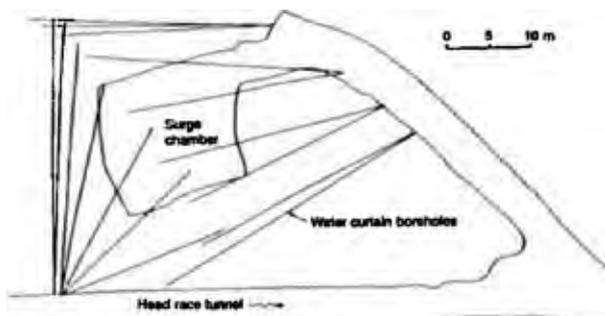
Plan of Tafjord air cushion surge chamber with water curtain.
